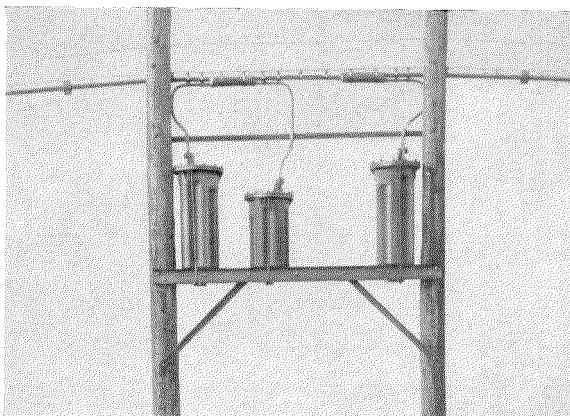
Installation of Aerial Toll Cable Loading on 4-case "H" Fixture
